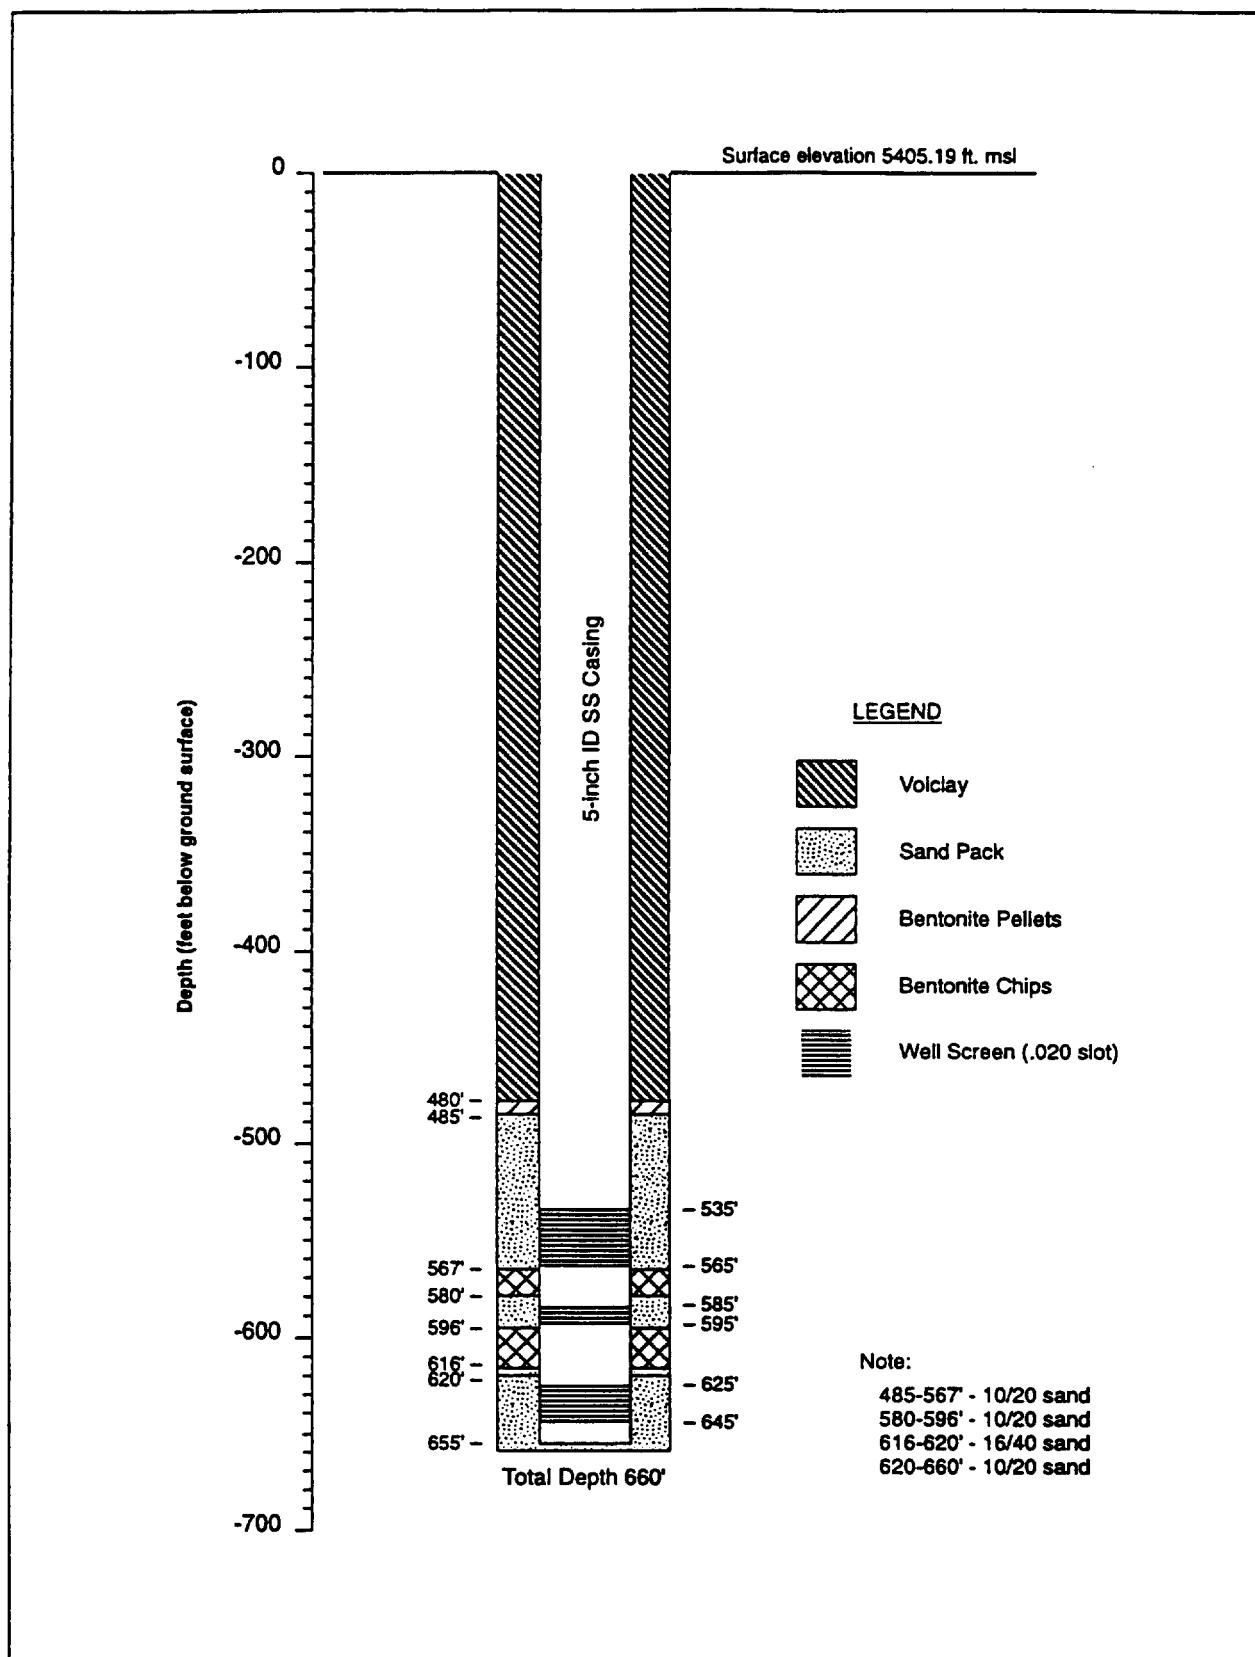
Well Completion Schematic for Parade Ground South Drill Site
